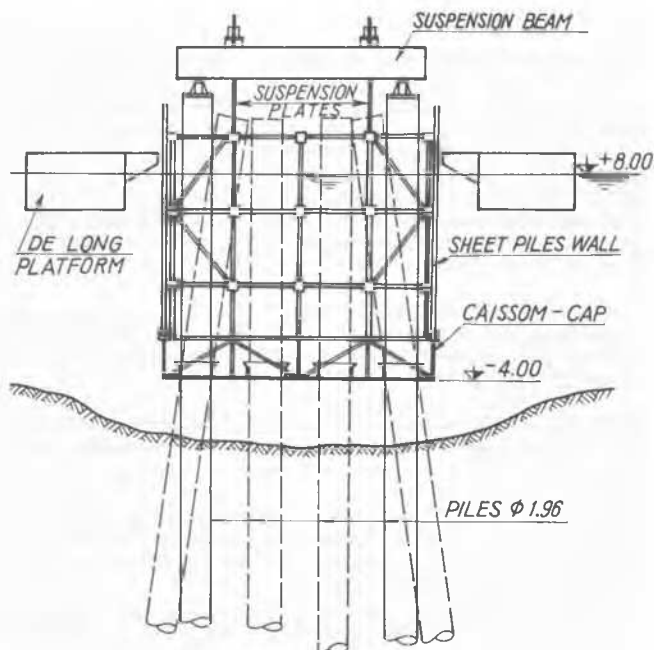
The caisson - cap and the sheet pile wall lowered at the final level
